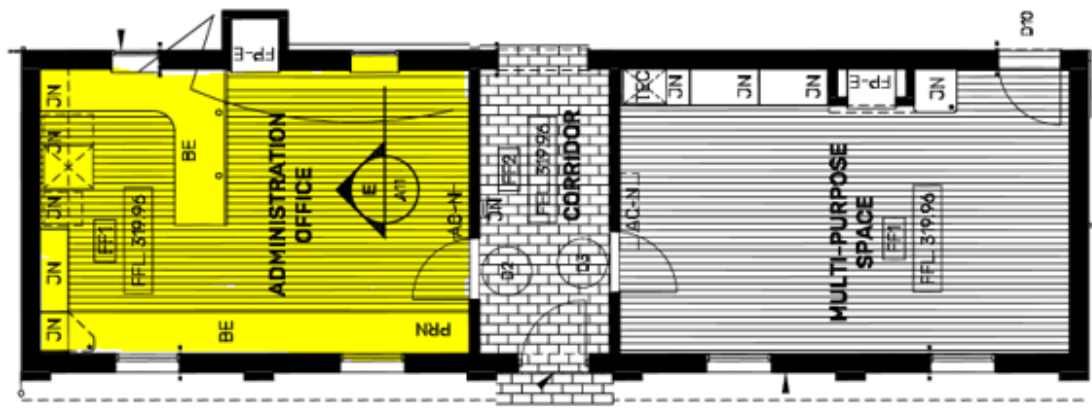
Licensed Floor Plan Area, Meeting Room 1, Mansfield Mechanics Institute
